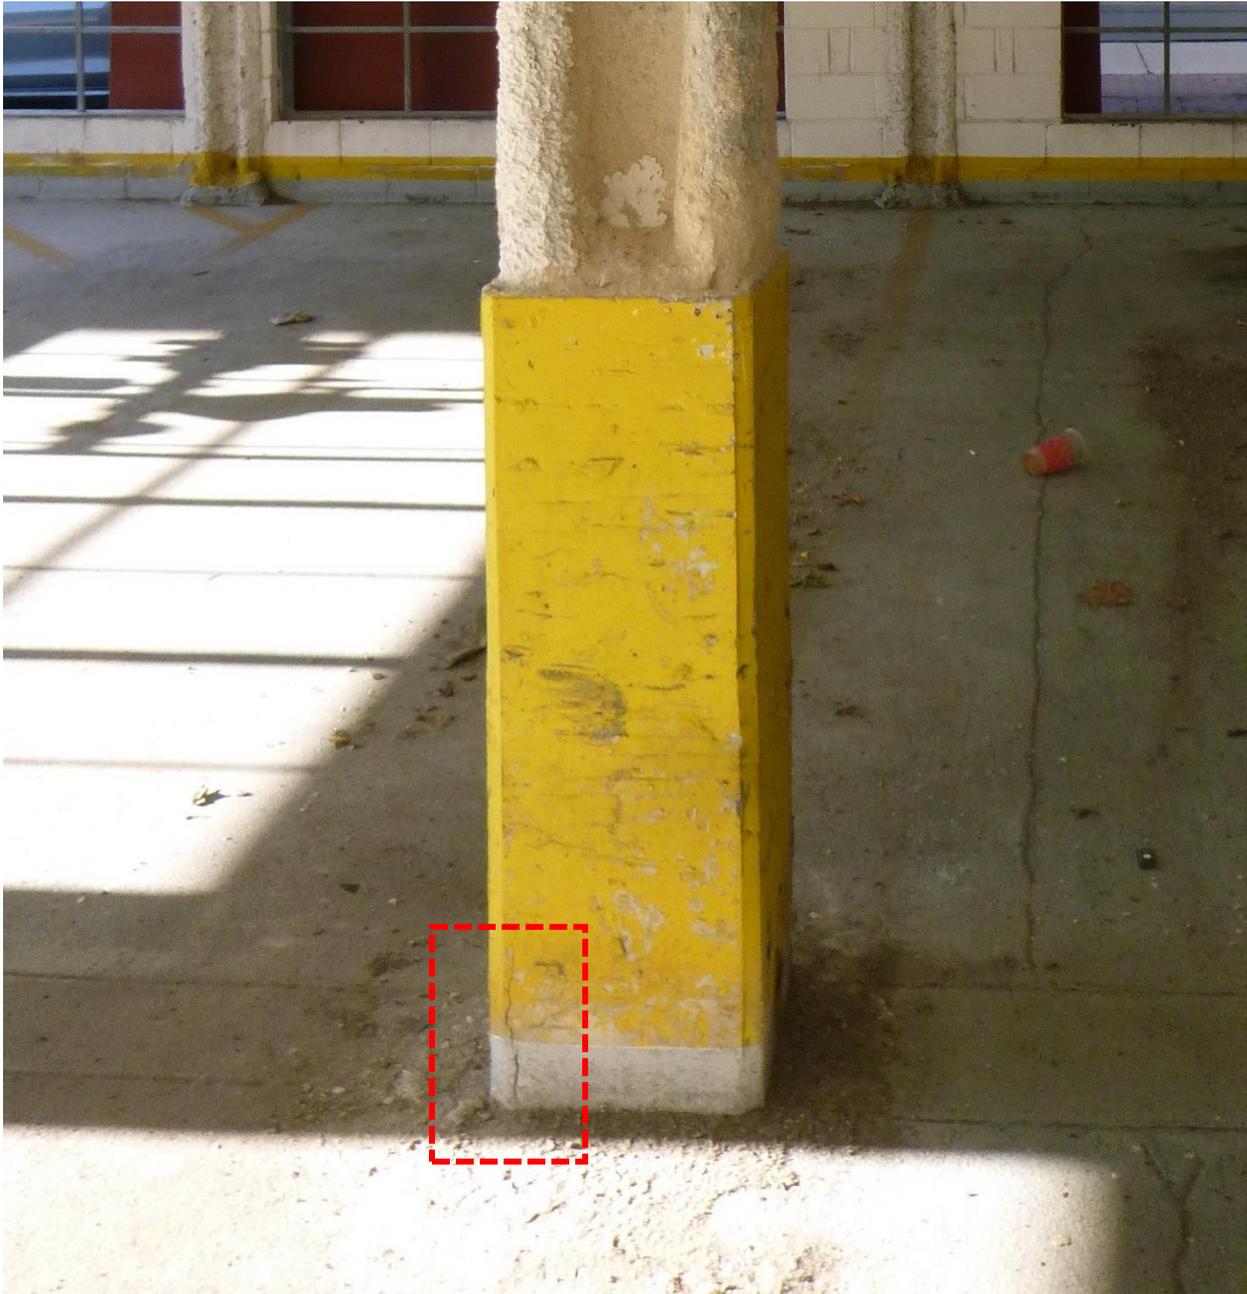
Delamination of concrete encasement at the base of a column above the ground floor, highlighted in red box
